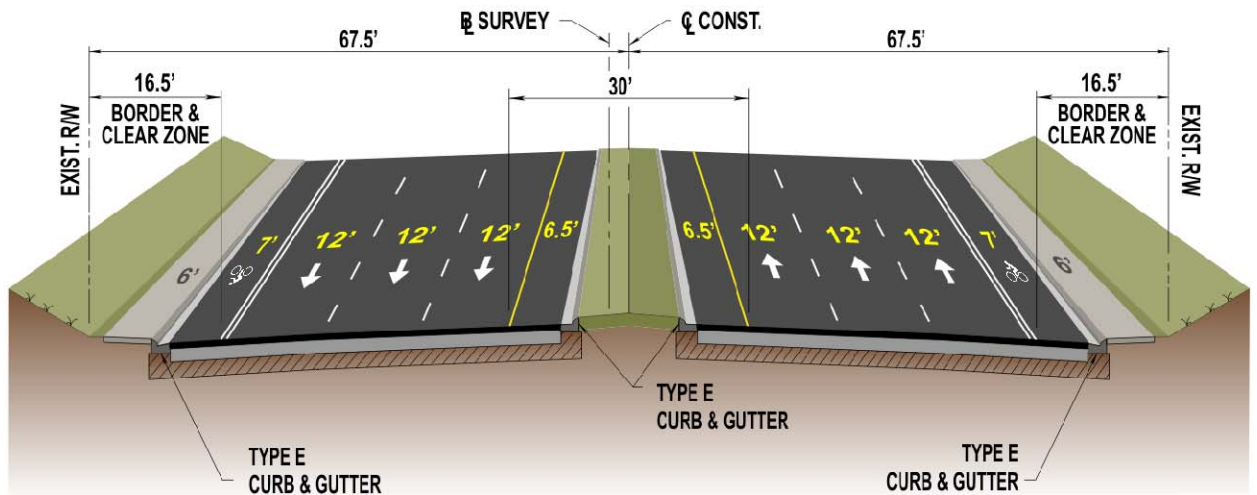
URBAN NEW CONSTRUCTION TYPICAL SECTION (SEGMENT 2B)
